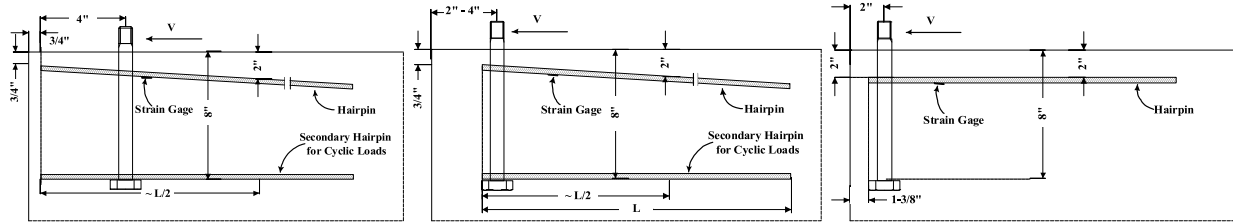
Anchor reinforcement in the tests by Klingner et al. (1982)
